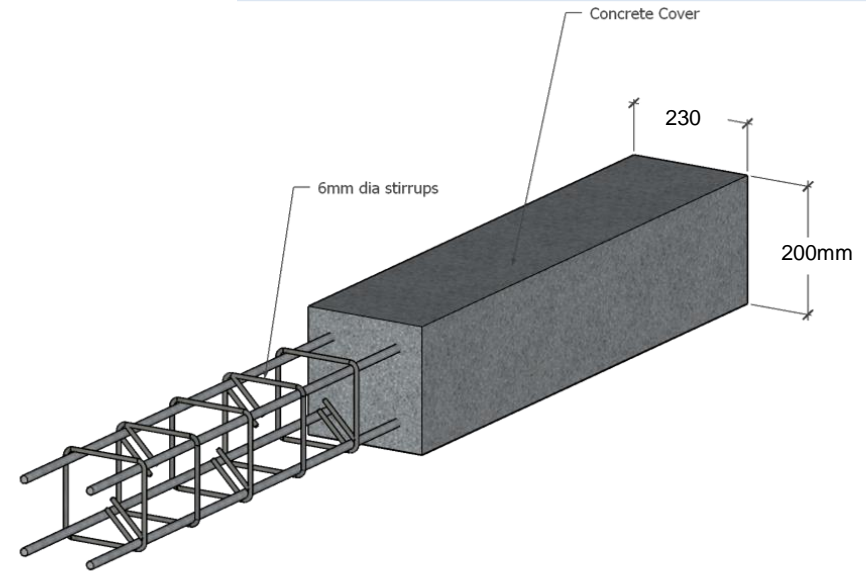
Concrete cover of 25mm over reinforcement cage
